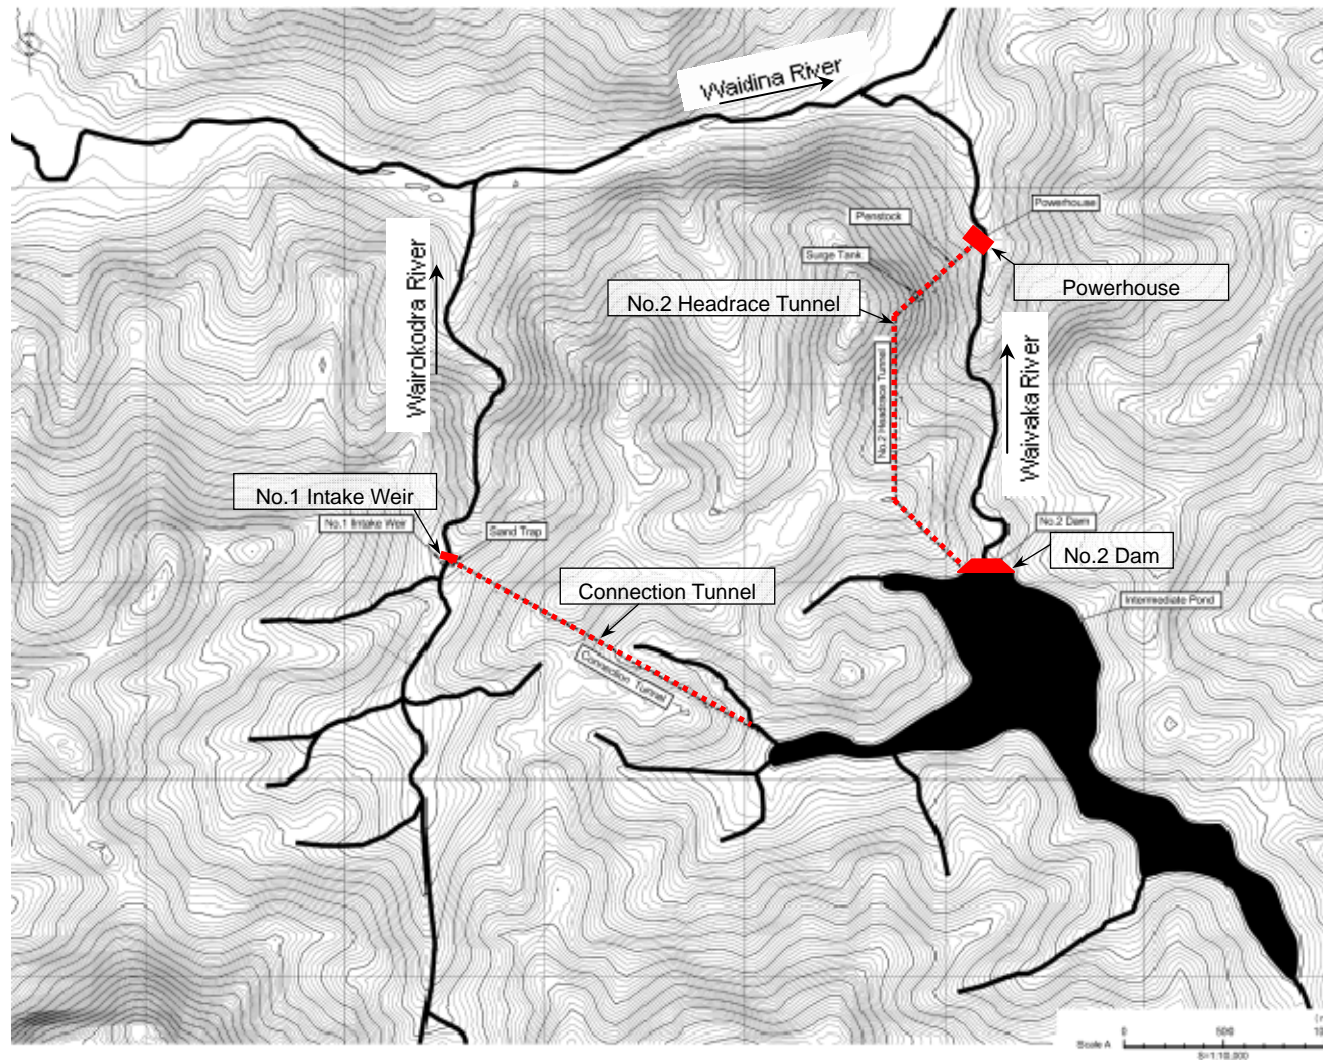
General Layout Plan for the No.29 Waivaka Hydropower Scheme
